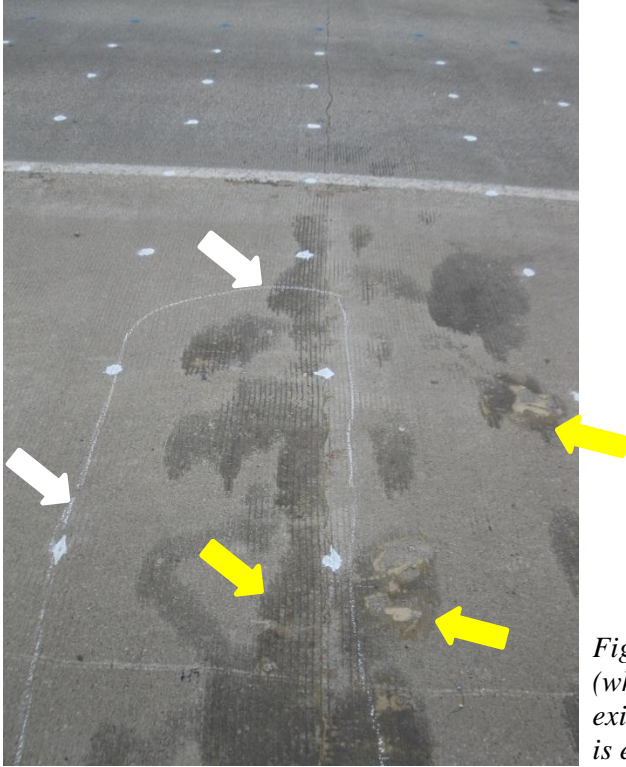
Delamination of surface concrete (white arrows) along crack where evidence of existing epoxy injection repairs (yellow arrows) is evident.
